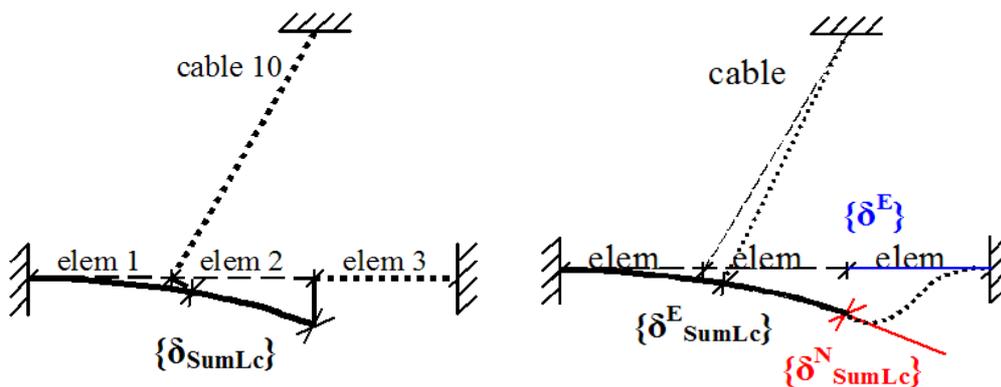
GEOMETRICAL INFORMATION WHILE ASSEMBLING NEW ELEMENT 3 AND CABLE 10
